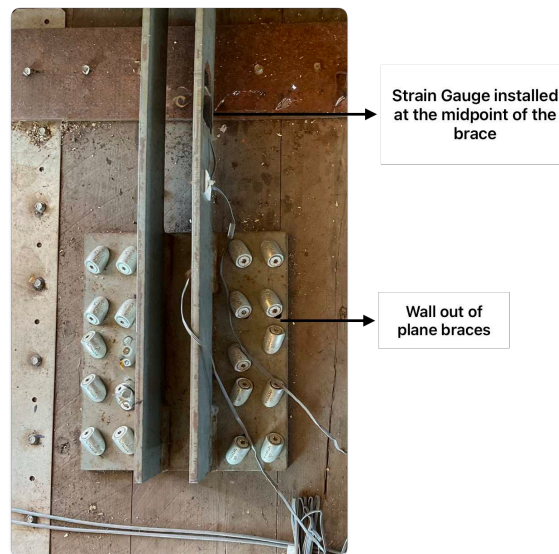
Instrumentation Detail at the Wall out of Plane Brace Connection
